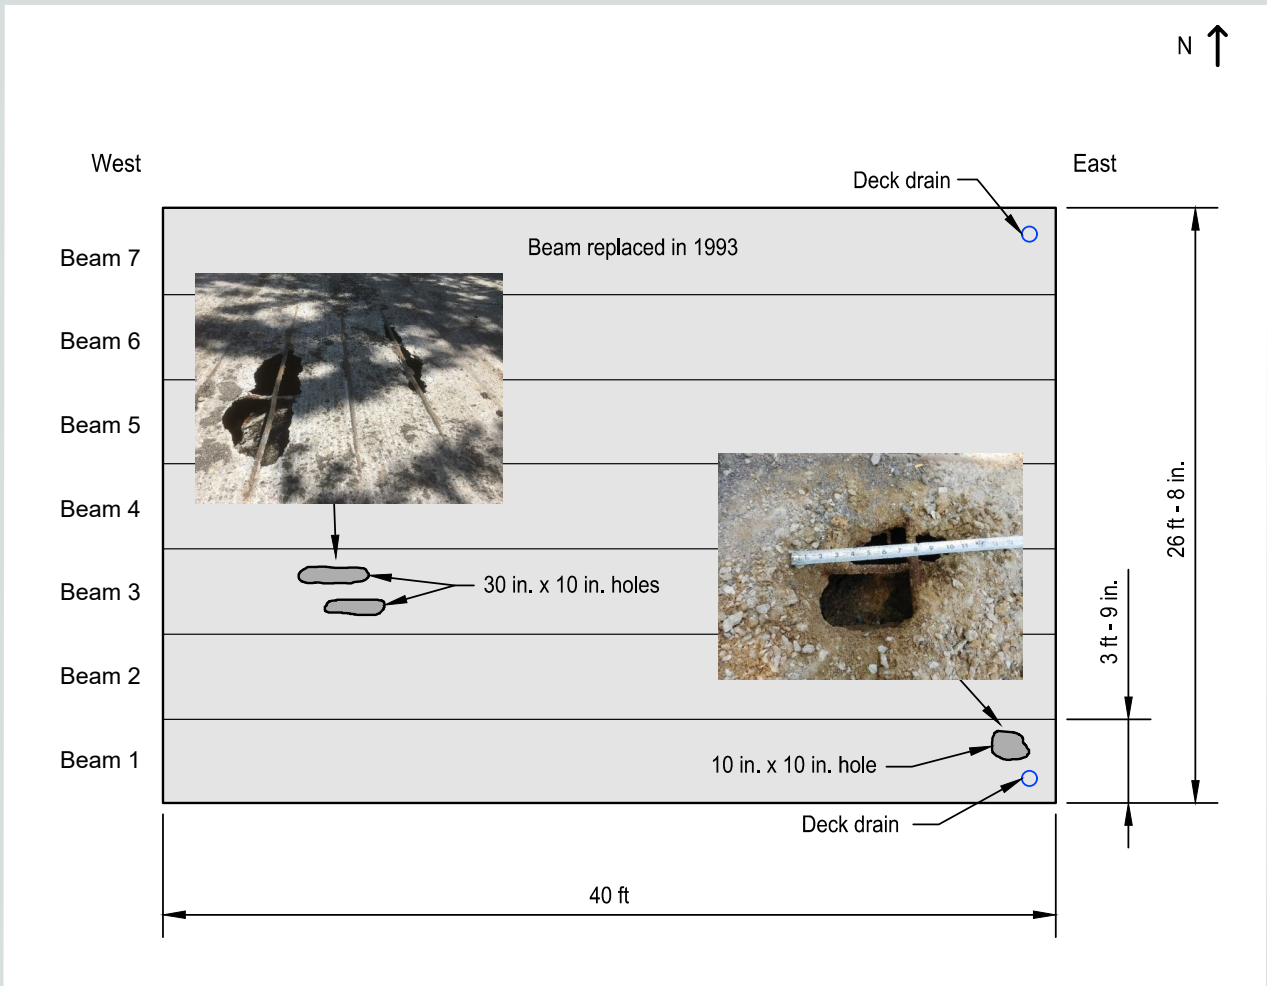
Plan view of the bridge top flange deterioration. Note: 1 in. = 25.4 mm; 1 ft = 0.305 m.
